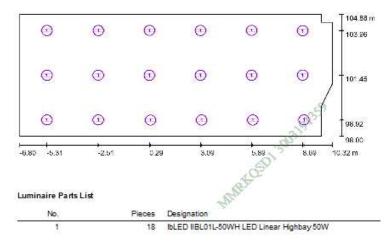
Luminaire Layout of Embedded System Laboratory
